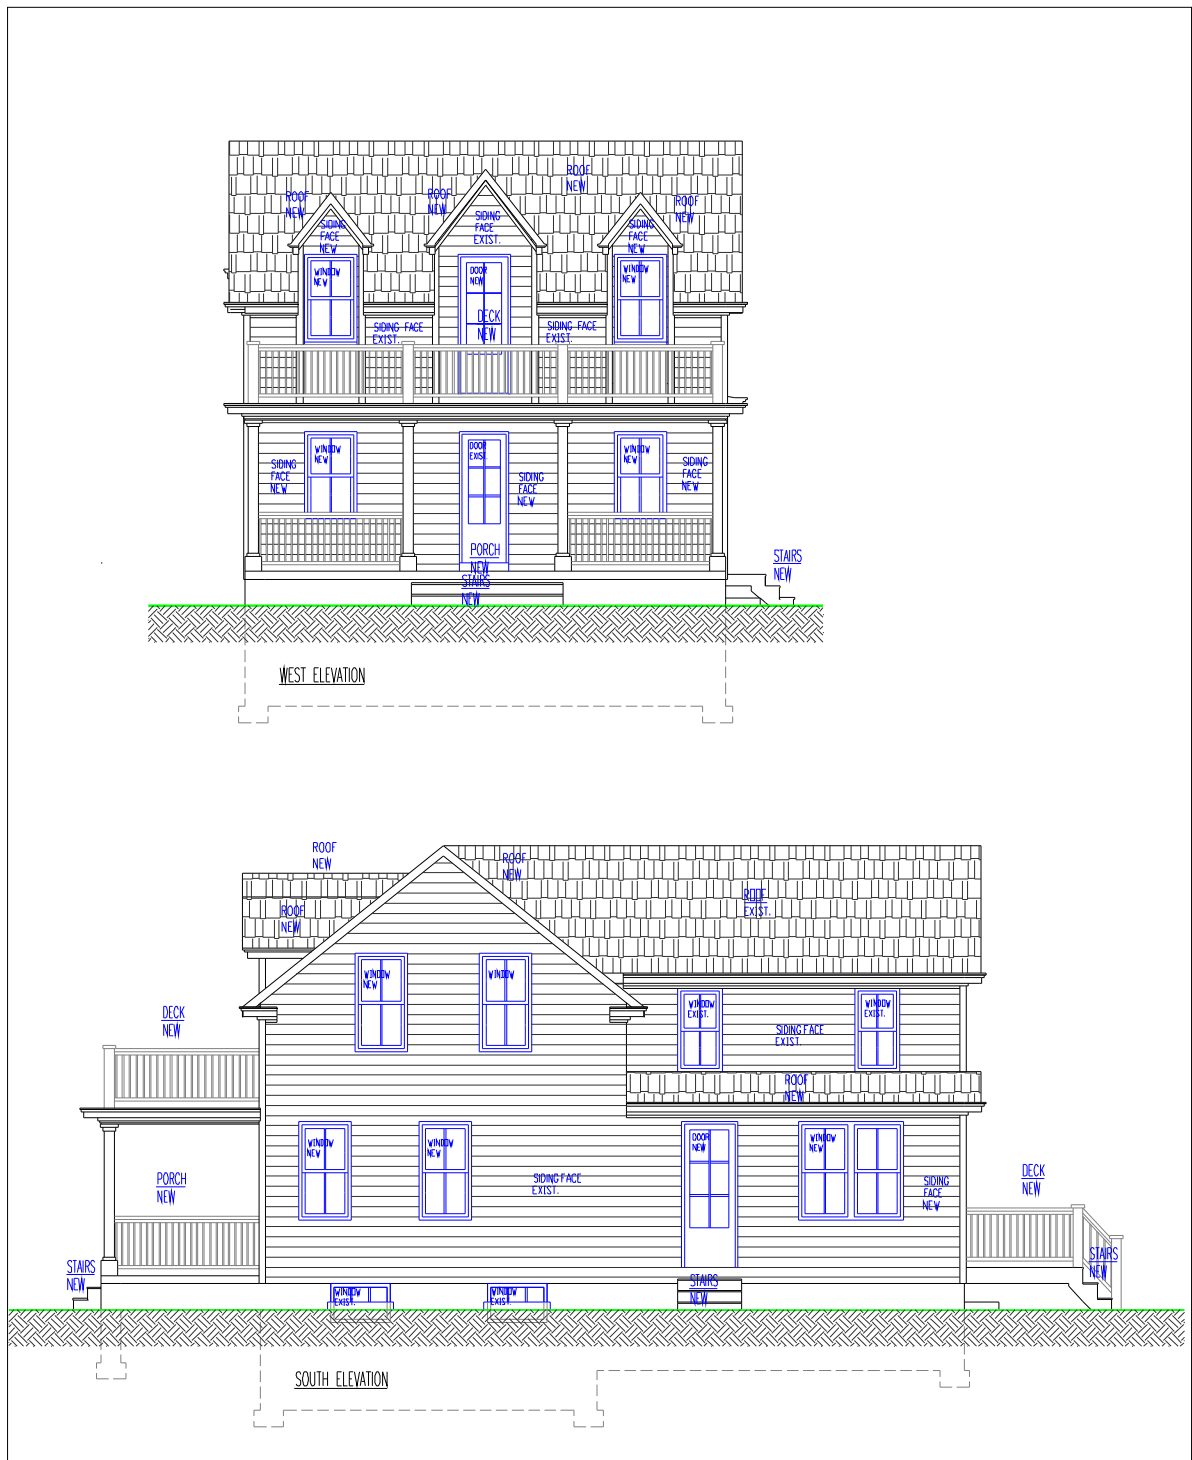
Street elevations of the proposed alterations. Mississauga Road South (front), above. Bay Street, below. Front roof slope is increased to 12:12 from 11.25:12. Two small dormers added to front roof slope. New windows match originals in design. Original open two-level front verandah is restored.
